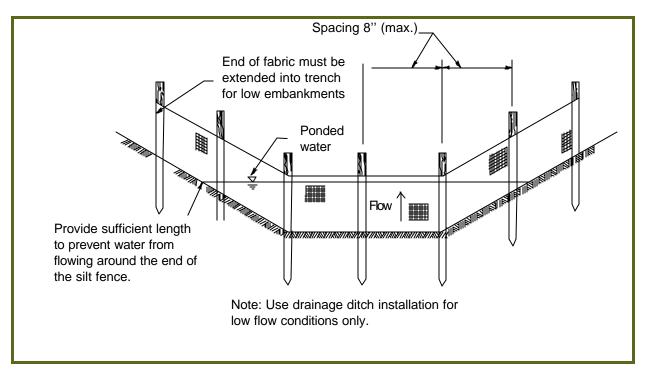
Silt Fence Installation in a Drainage Ditch
